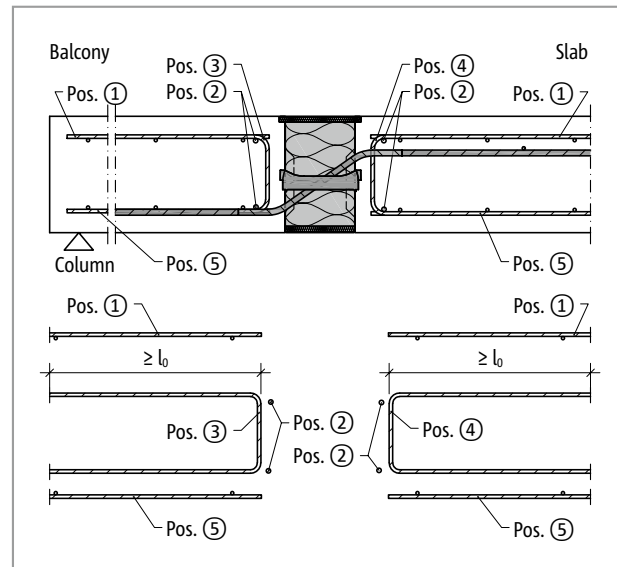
Schöck Isokorb® XT type Q-V5 to Q-V11: On-site reinforcement
